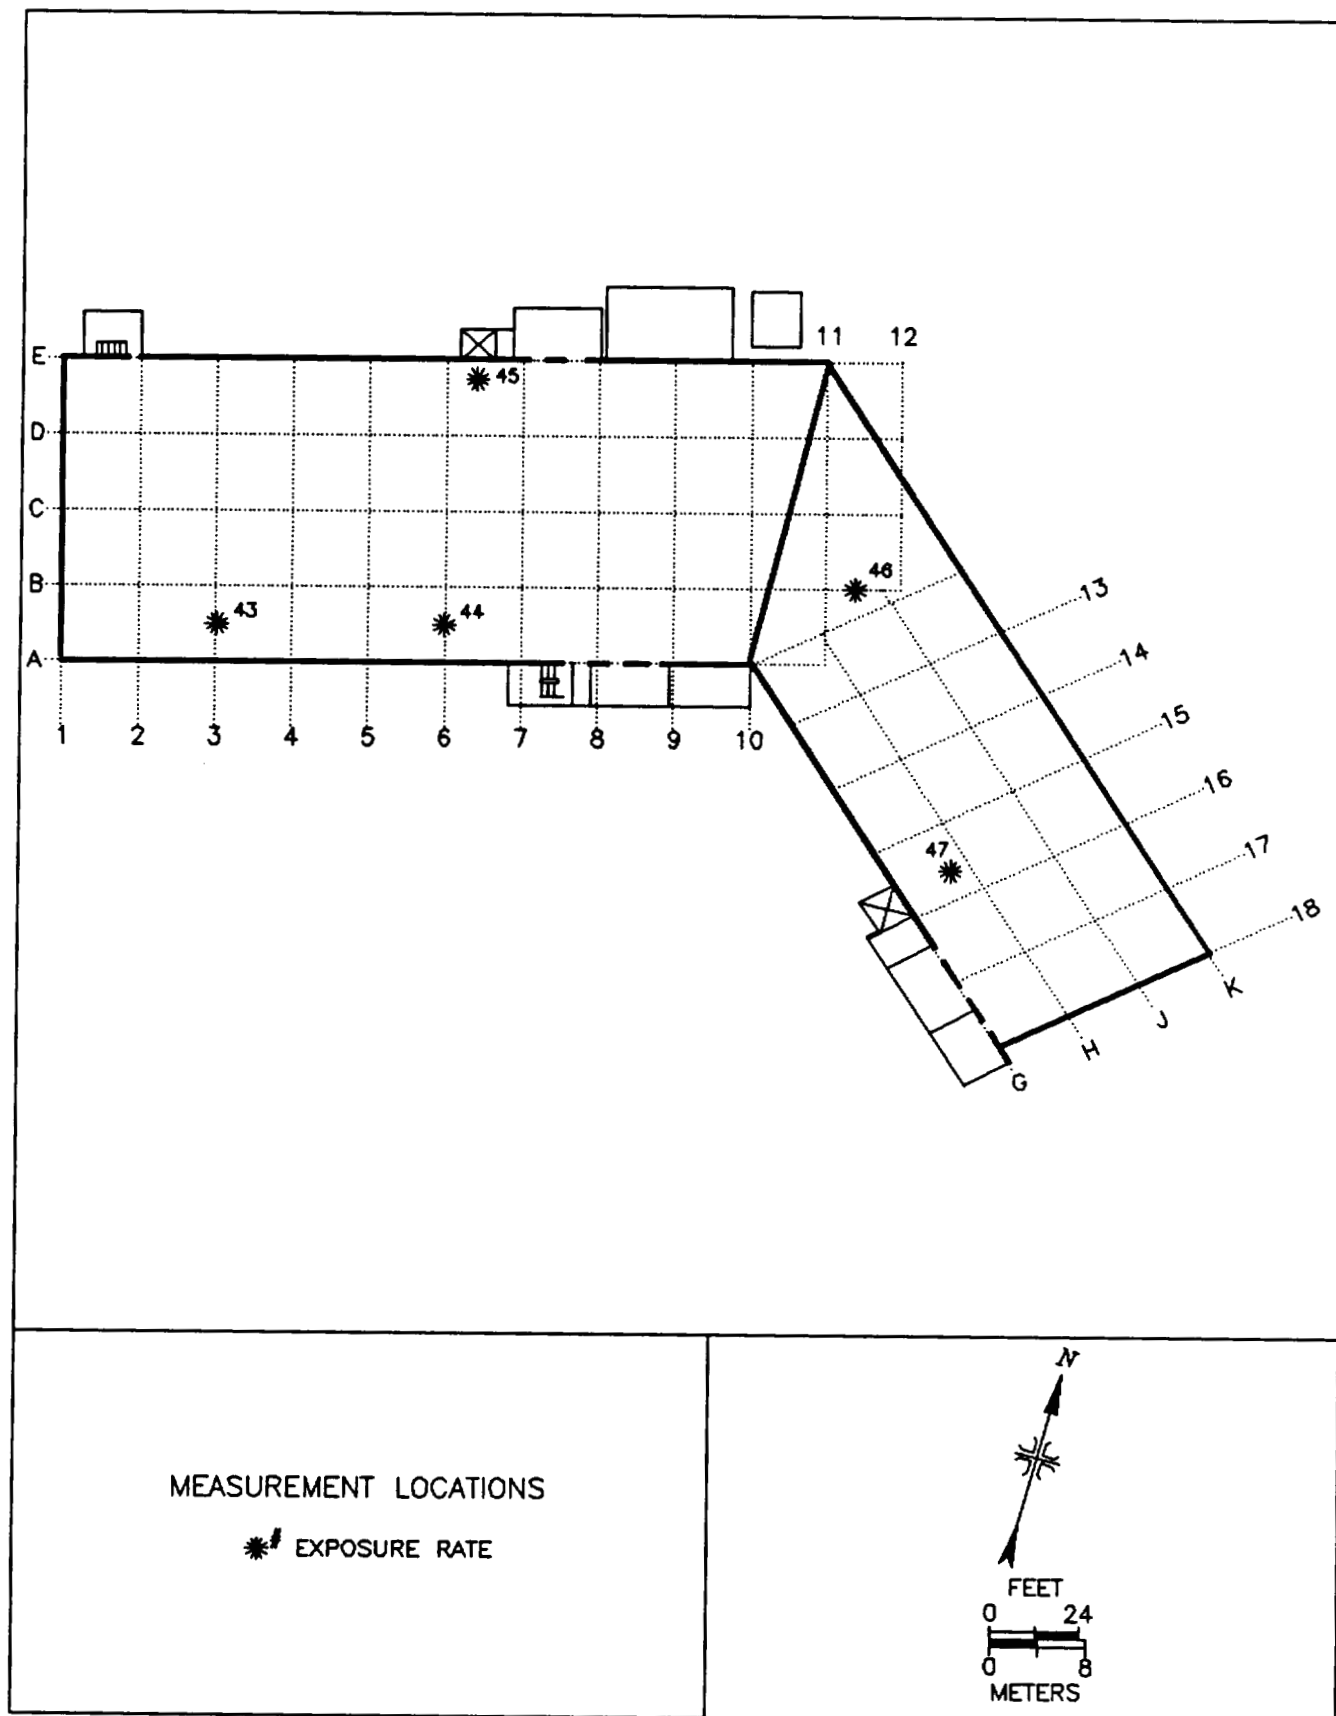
Building 8, Third Floor – Exposure Rate Measurement Locations
